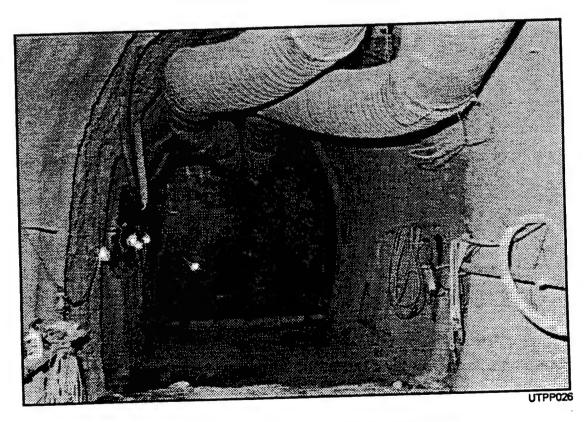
Finished Rear (Lower) Bulkhead from Inside Plug
